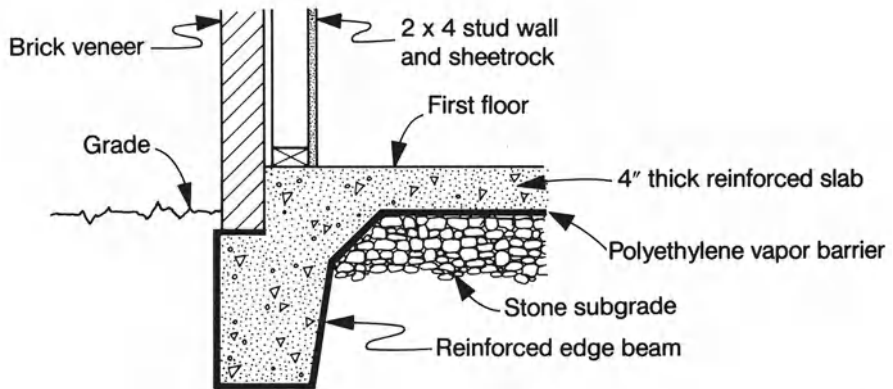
Typical edge beam detail for a residential slab on ground.
